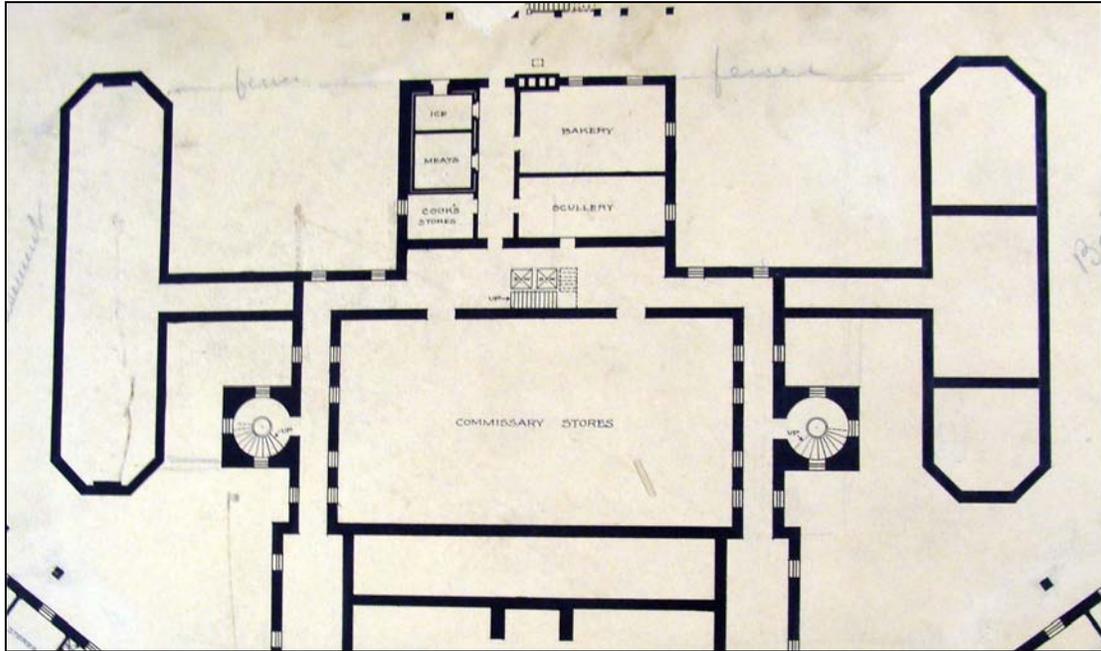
Excerpt of "Proposed Battle Mountain Sanitarium Basement Floor Plan" showing Mess Hall/Service Building, c. 1902
